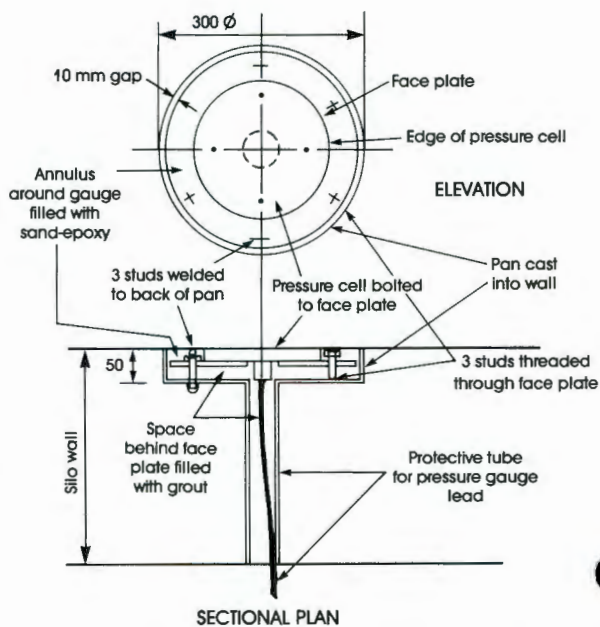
Method of mounting pressure gauge in wall of reinforced concrete silo
